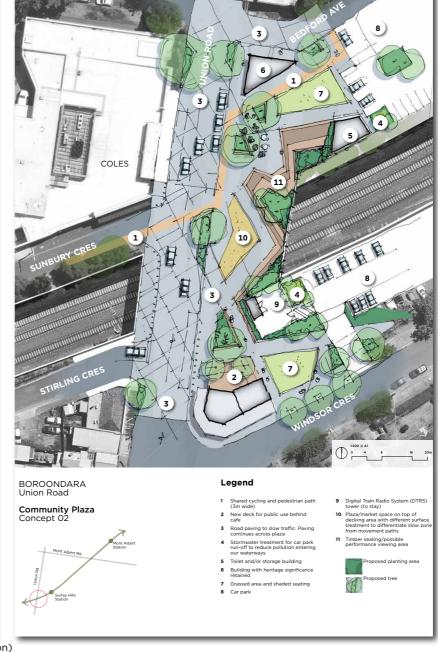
Concept Plans used in consultation for Union Road Plaza (artist impression)
